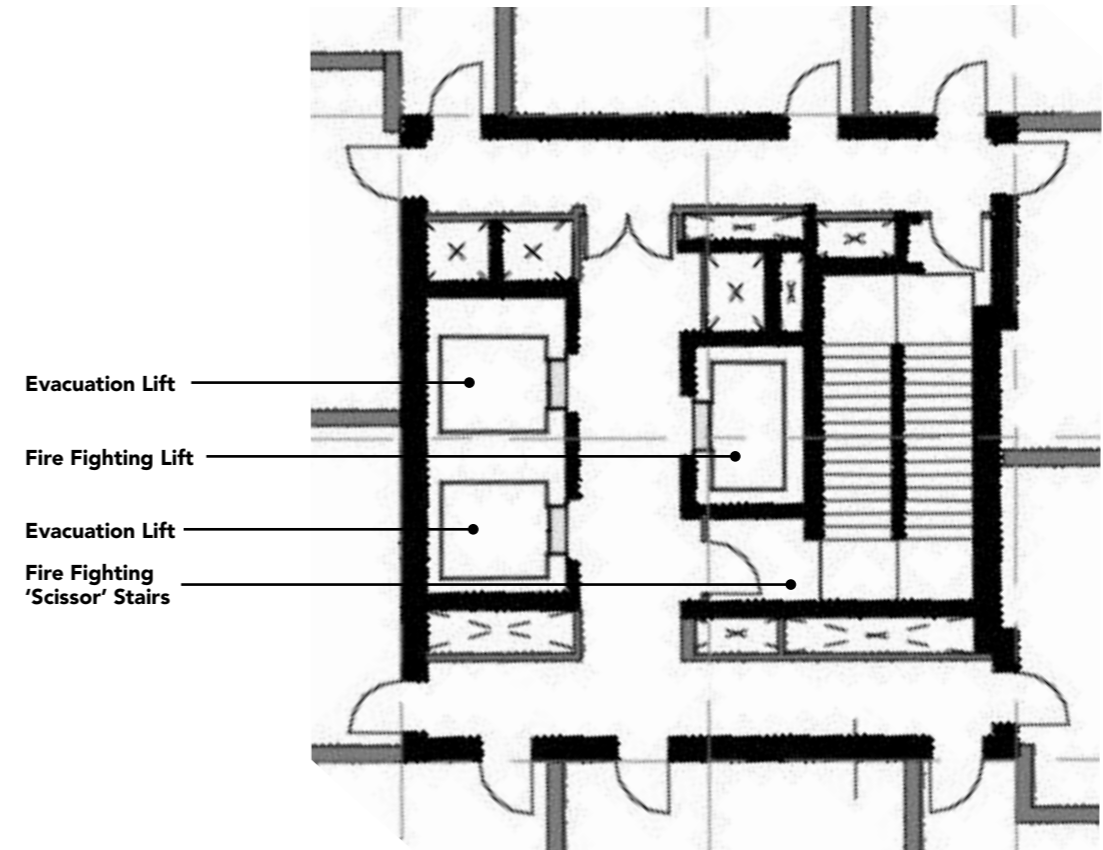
Stage 1b Core Arrangement with Dual Scissor Stairs – towers
